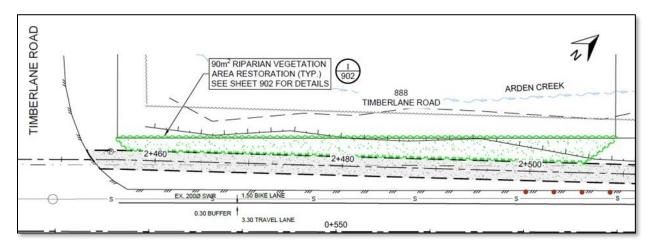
Vegetation restoration adjacent to Arden Creek at Timberland Road.
